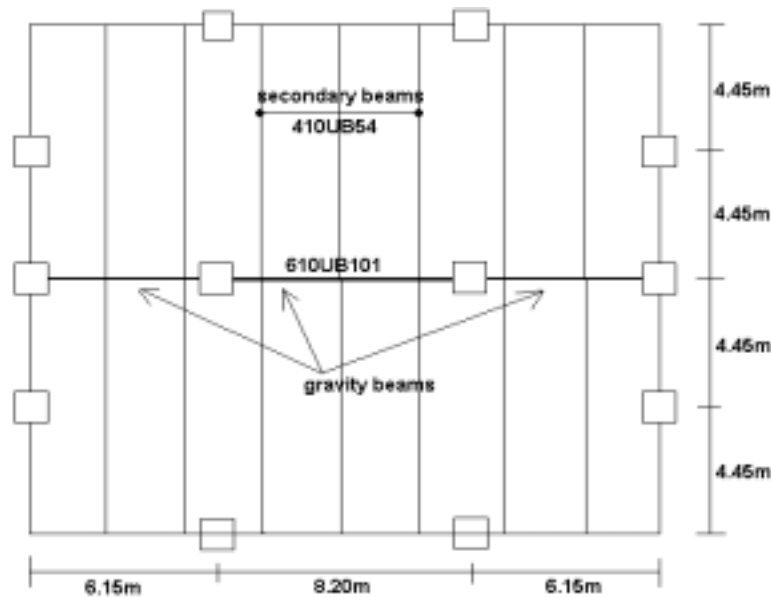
Floor plan of the Telecom Building in Auckland (Clifton, 1999)
